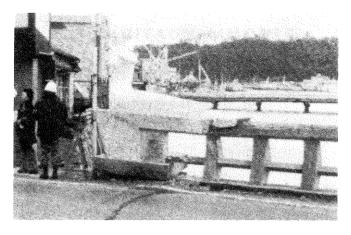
FAILURE OF CONCRETE HANDRAIL and Lateral Movement of Concrete Girder (Shin-Shimoda Bridge, Shimoda City).
